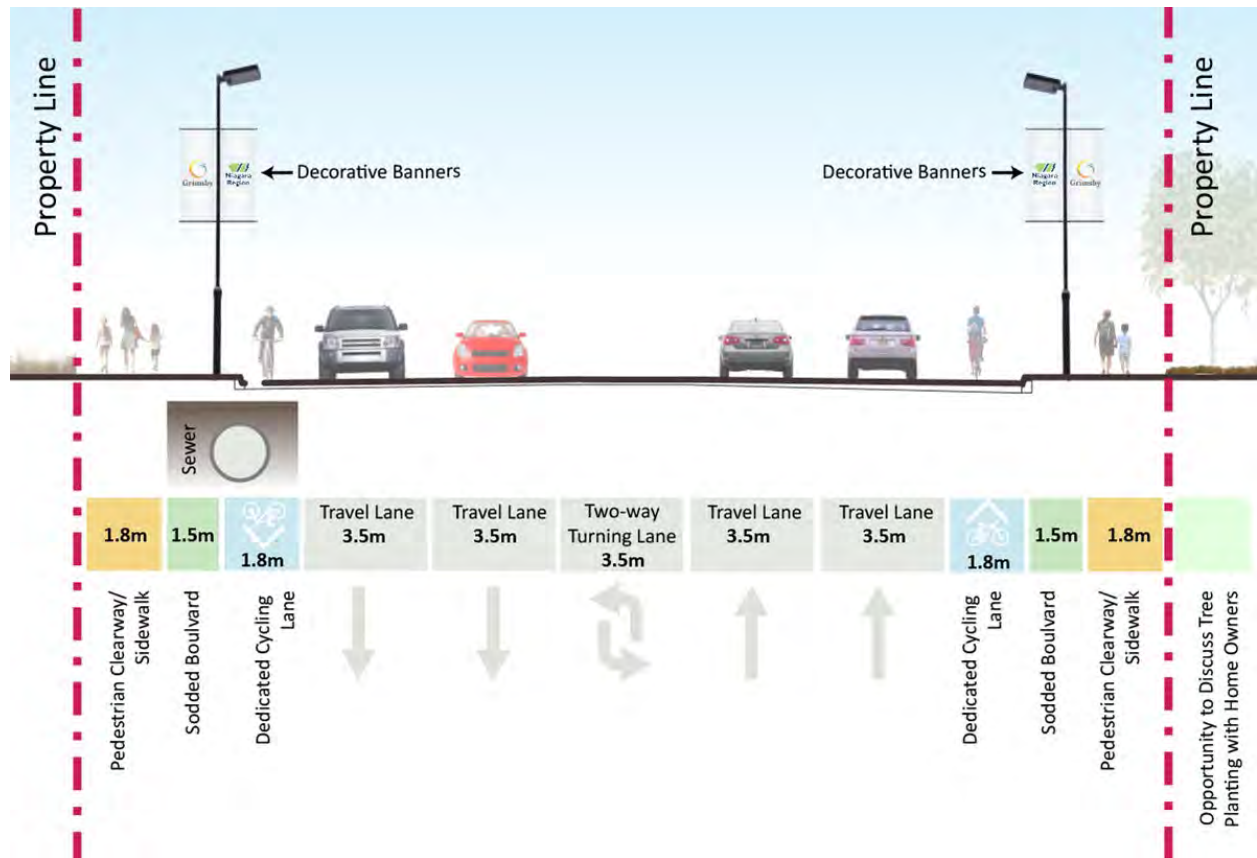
Typical Casablanca Boulevard Cross Section (north of Livingston Avenue)
